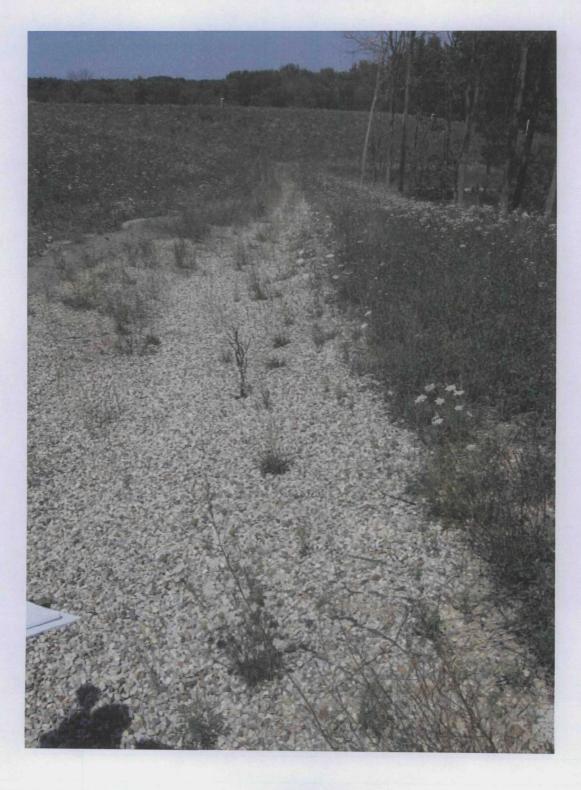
Southeastern surface water swale with exposed geotextile and erosion
